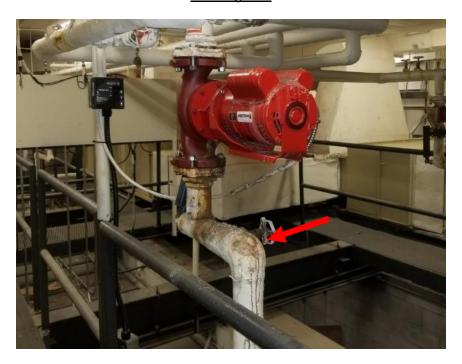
Mezzanine above boiler room, under red Armstrong machine, north-east side of room, 1 poor condition fitting.
